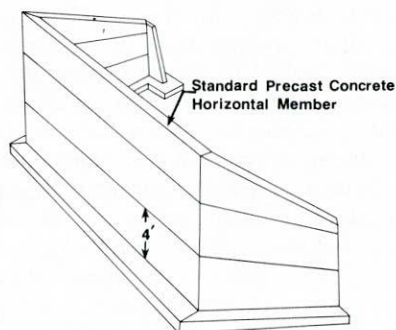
A. Abutment With Precast Concrete Horizontal Members (After Hanson Ref.1)
